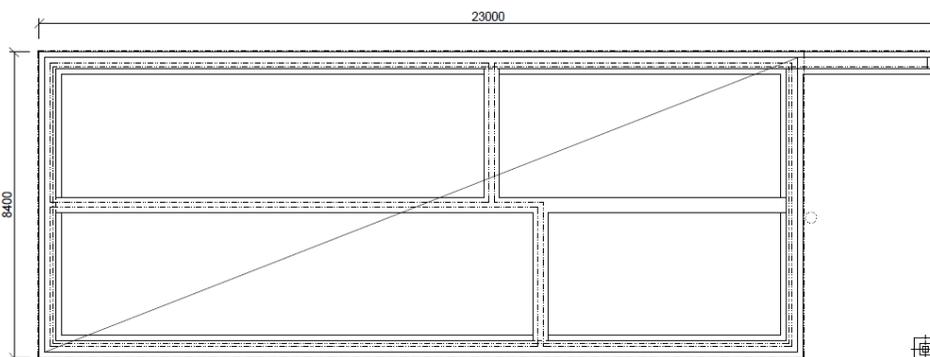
Floor plan of the foundation structures - the most used flat foundations.
